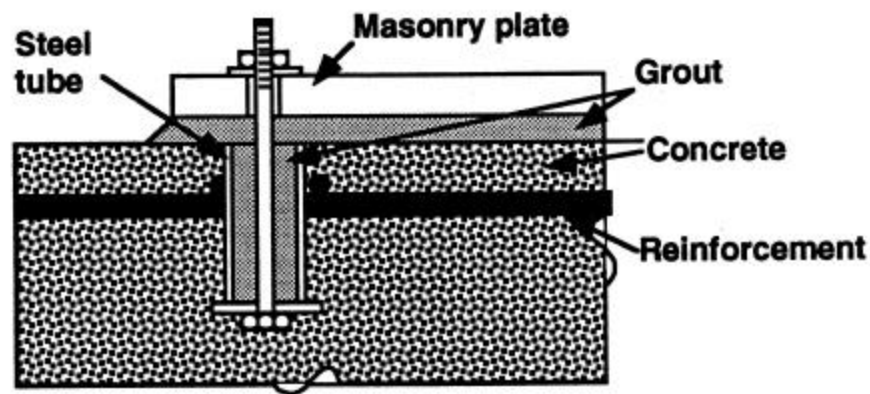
Steel Tube Detail for Anchor Bolts
